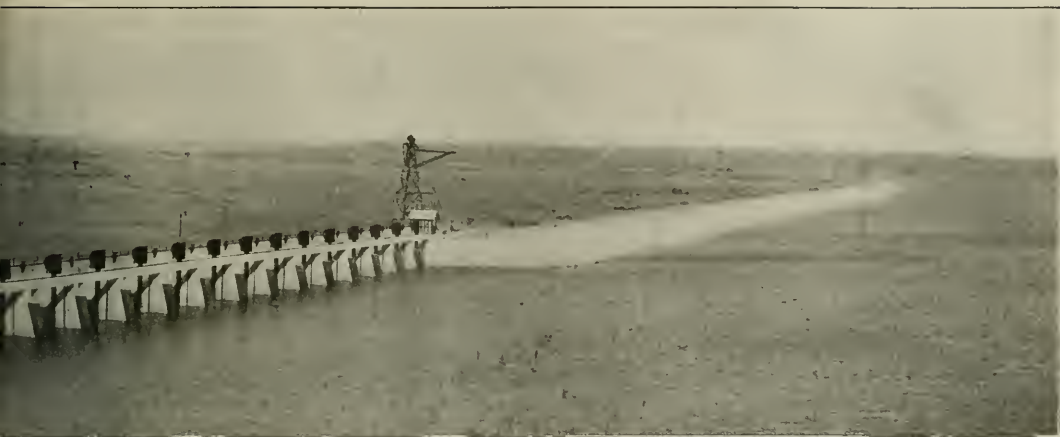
HEADGATE STRUCTURE, SPILLWAY AND EARTH EMBANKMENT OF BASSANO DAM
